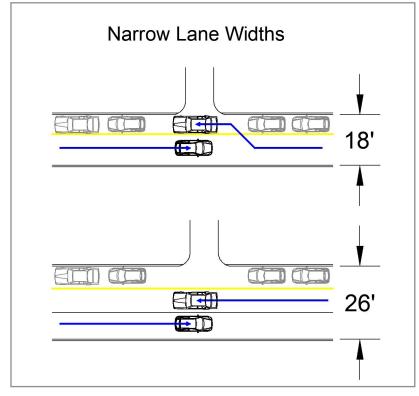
Examples of narrow road configurations. Top: one drive lane and one parking/queueing lane; Bottom: two drive lanes and one parking lane
